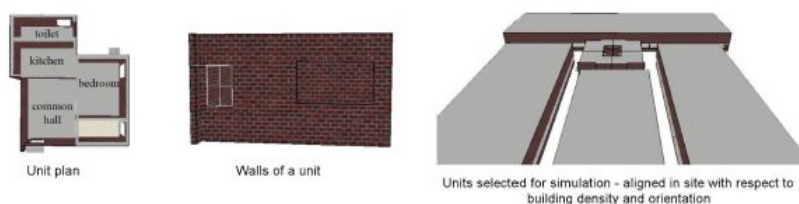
Model of type 1 house after changing the building materials used to that of type 2 house - prepared for indoor thermal comfort simulation in DesignBuilder
